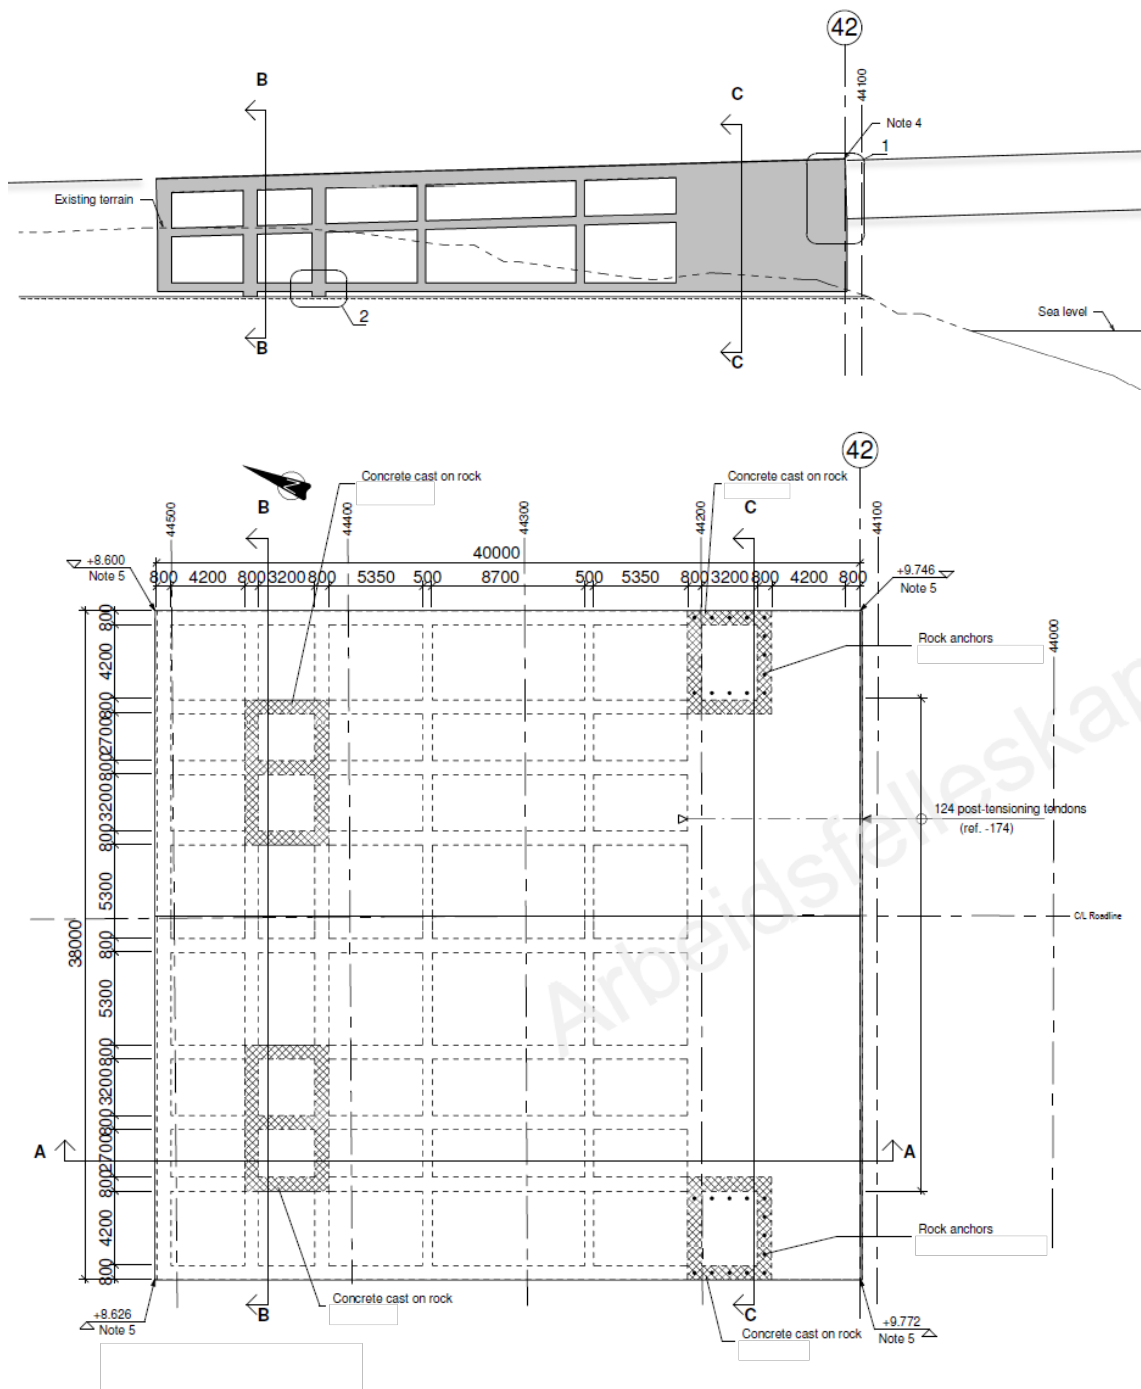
Elevation and plan of north abutment. The shaded areas show the foot print, i.e. concrete cast on rock. The principles are the same for abutment south.
